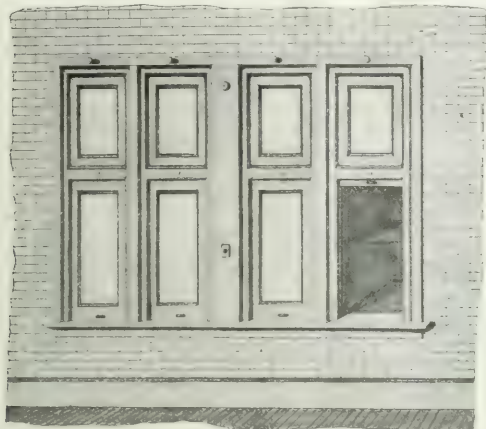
TYPICAL ARRANGEMENT OF DOORS
